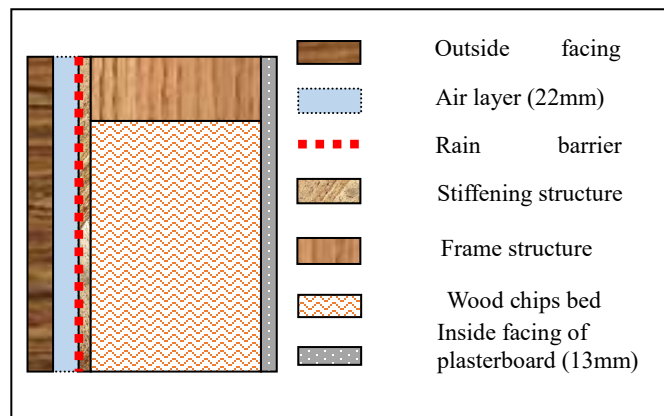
Sectional view of the building vertical wall: integration of wood chips bed into it
